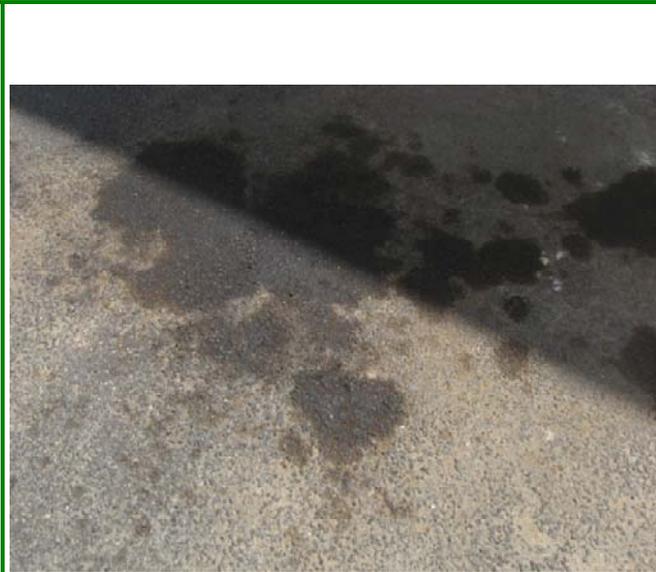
Minor staining on the asphalt-paved surface (typical).
